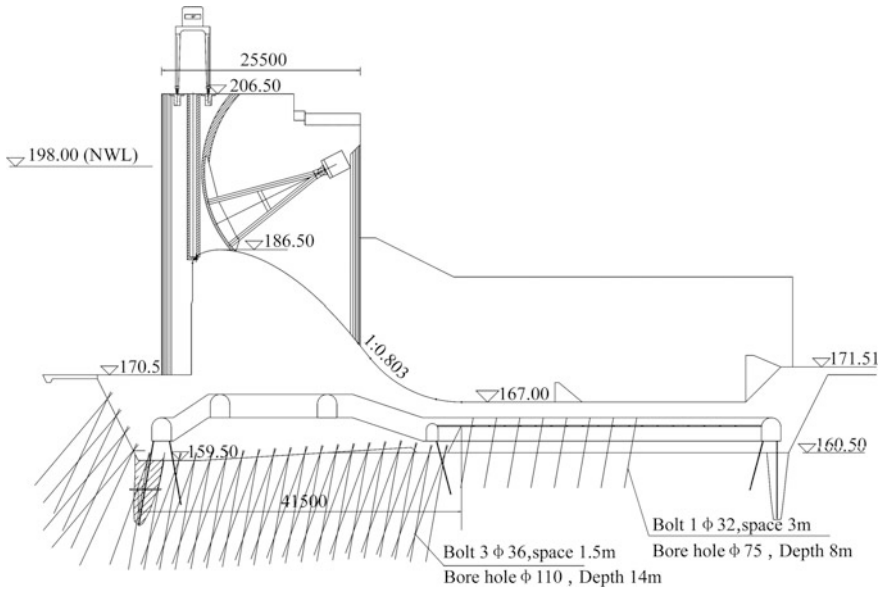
Layout of the rock bolts at the spillway dam foundation
